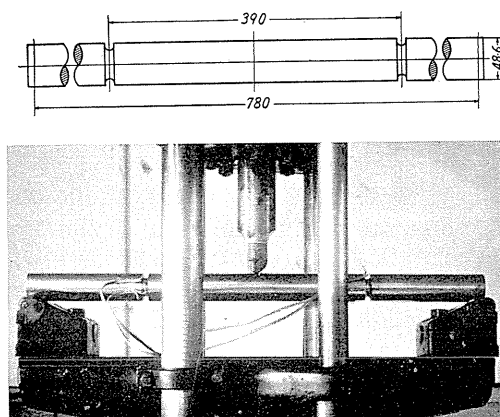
Testing machine and dimensions of test piece in millimeter.
